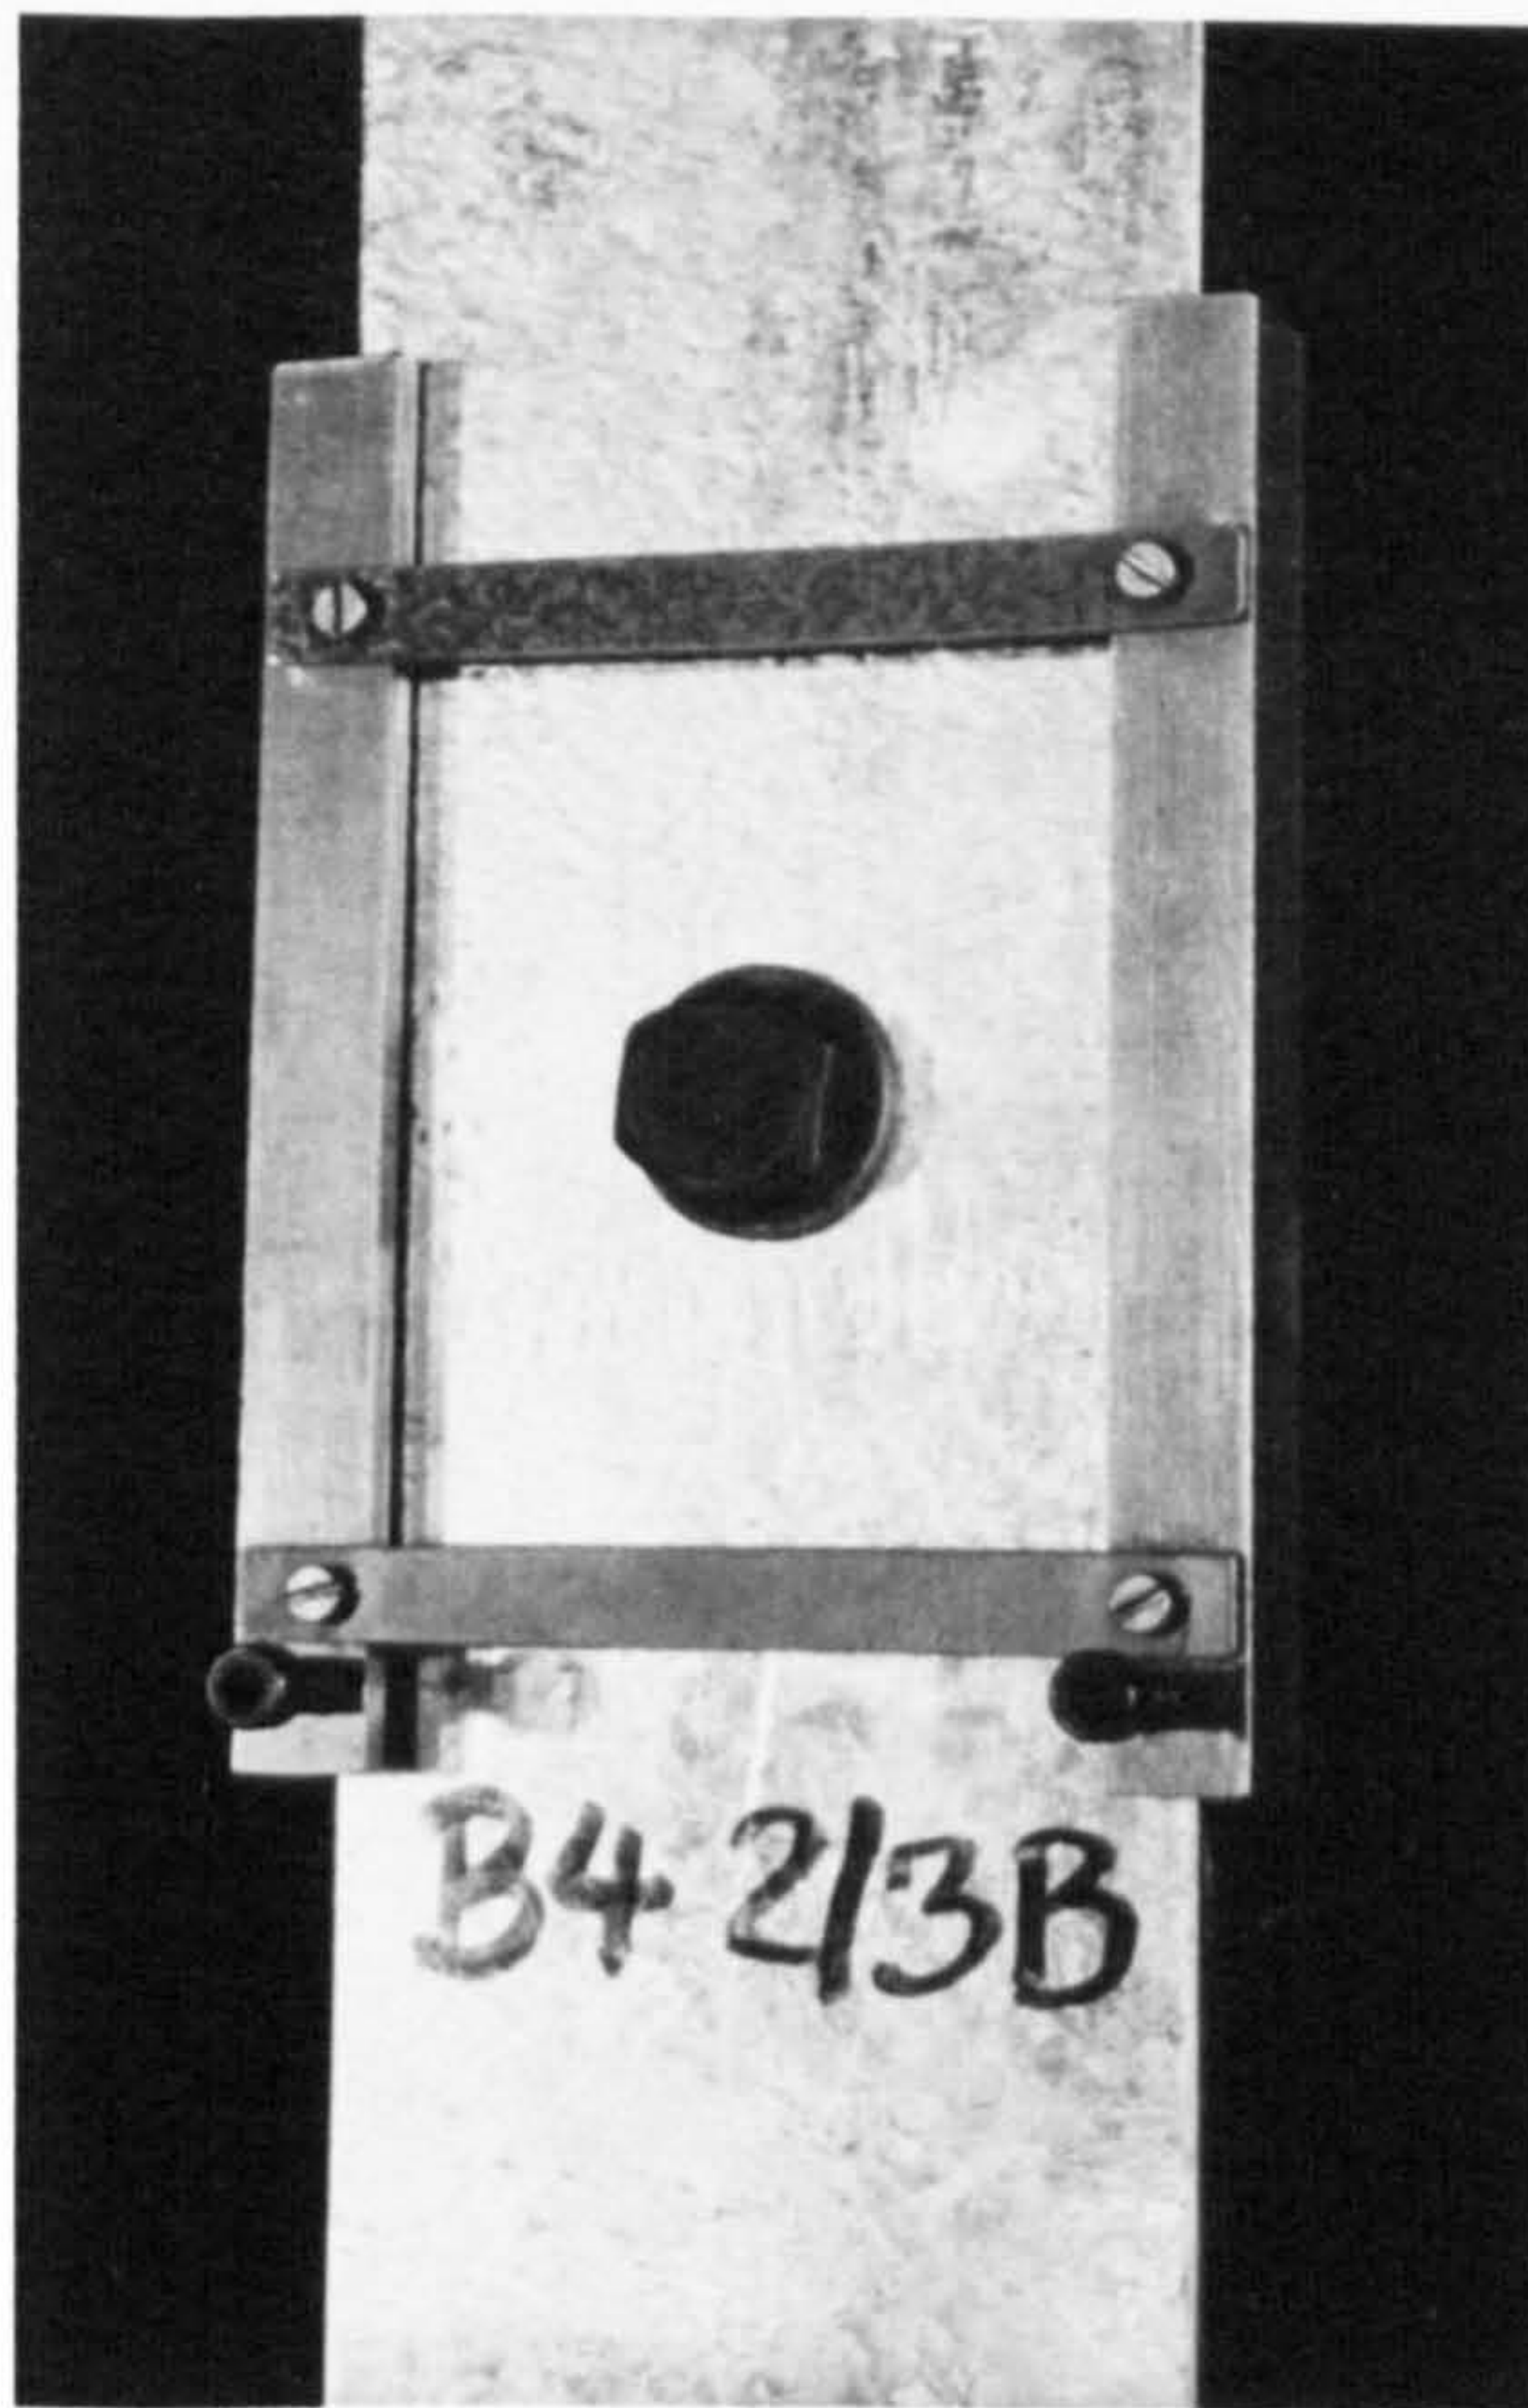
Restraint rig designed to prevent out of plane curling of sheet
